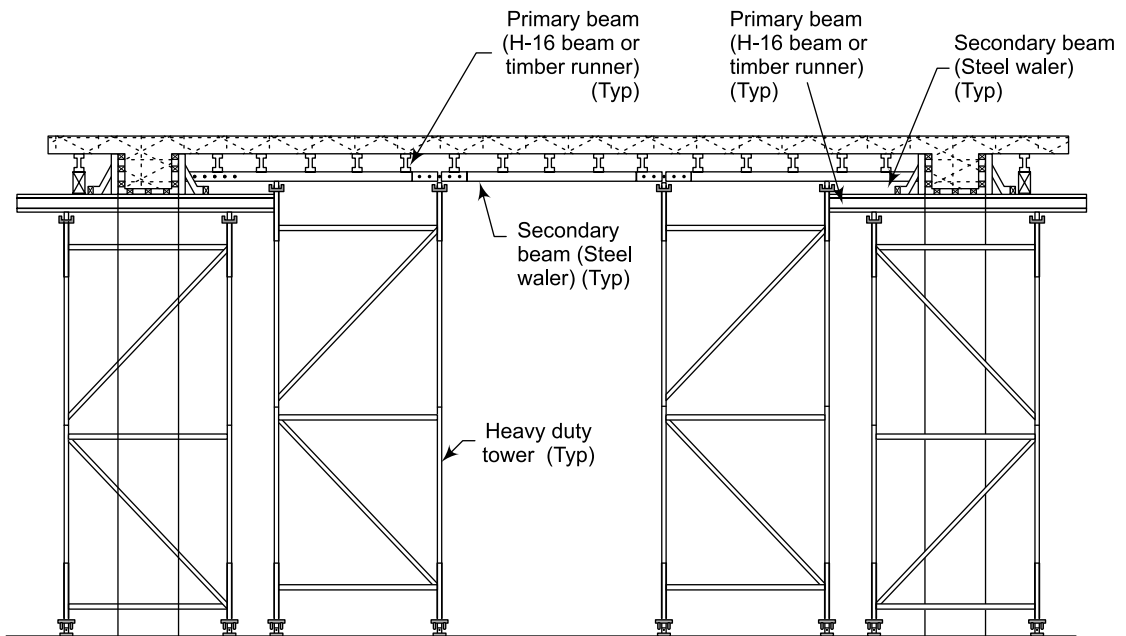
Plan of Formwork Arrangement Using Shoring Towers.
